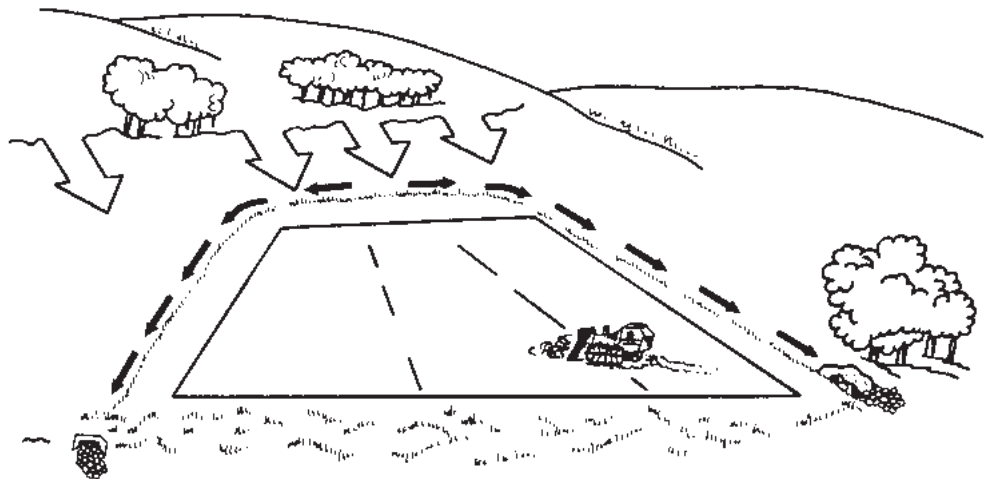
Perimeter dikes prevent surface runoff from entering construction sites.
